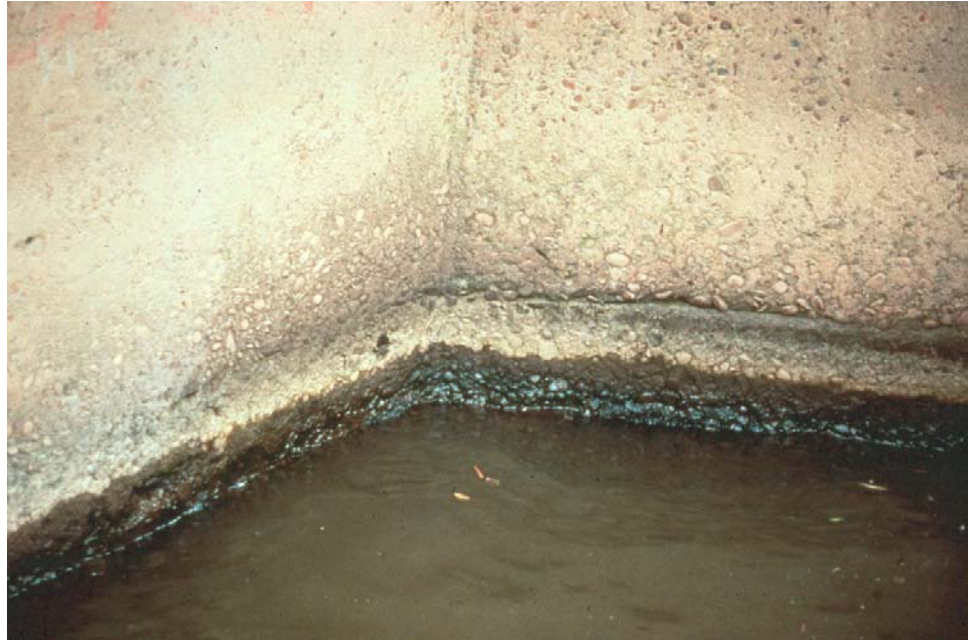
Freeze-Thaw Damage on a River Pier
